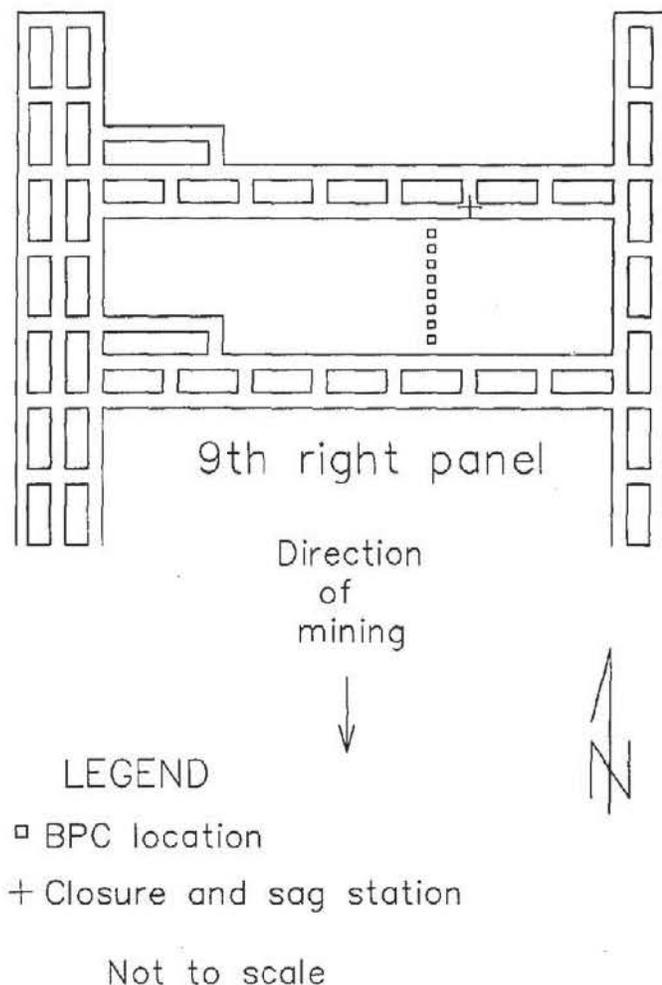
Layout of barrier pillar test area in a Utah mine.
